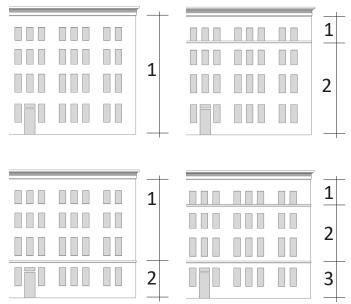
C.1.b: FAÇADES divided into 1, 2, and 3 horizontal layers
